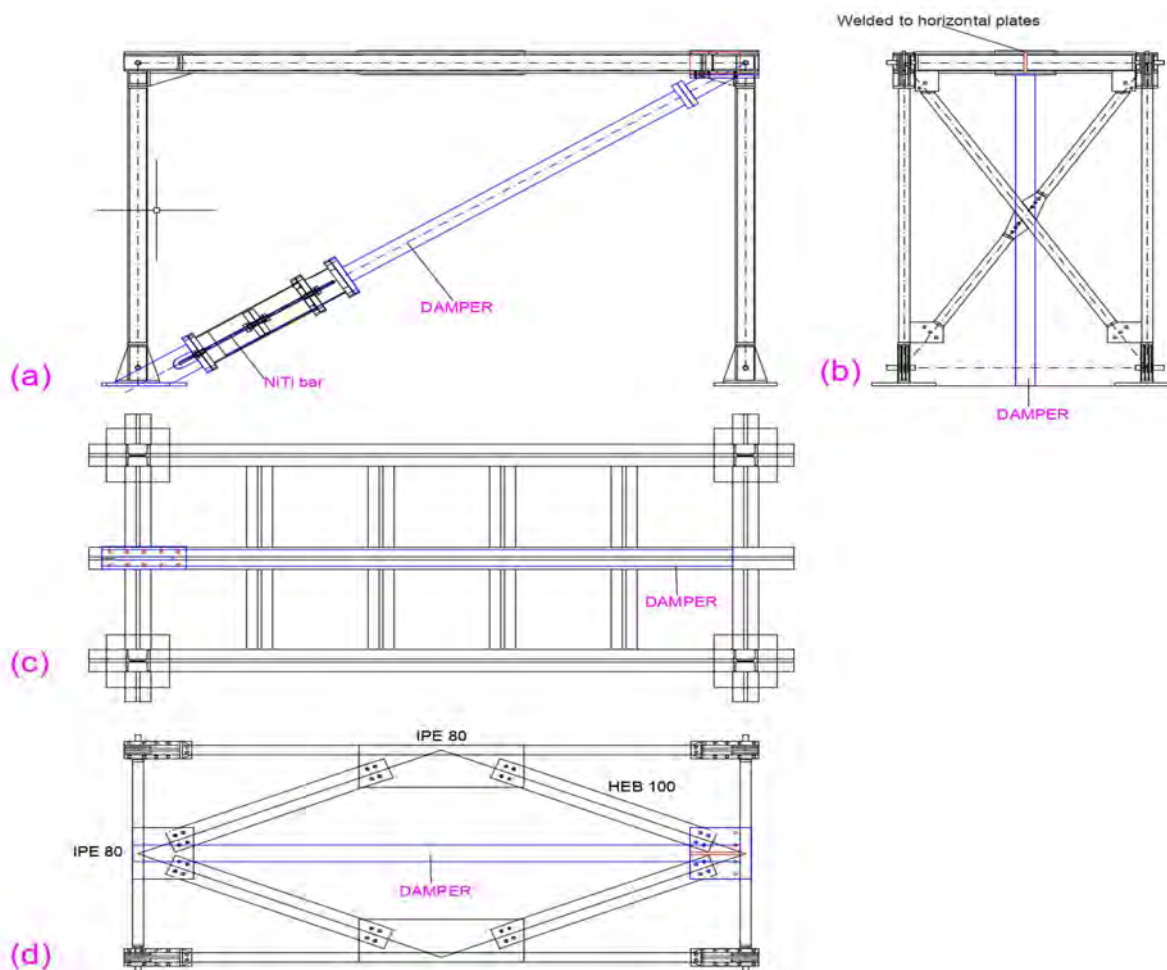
Test specimen. (a) elevation (front view); (b) elevation (lateral view); (c) column bases in plan; (d) top view in plan
